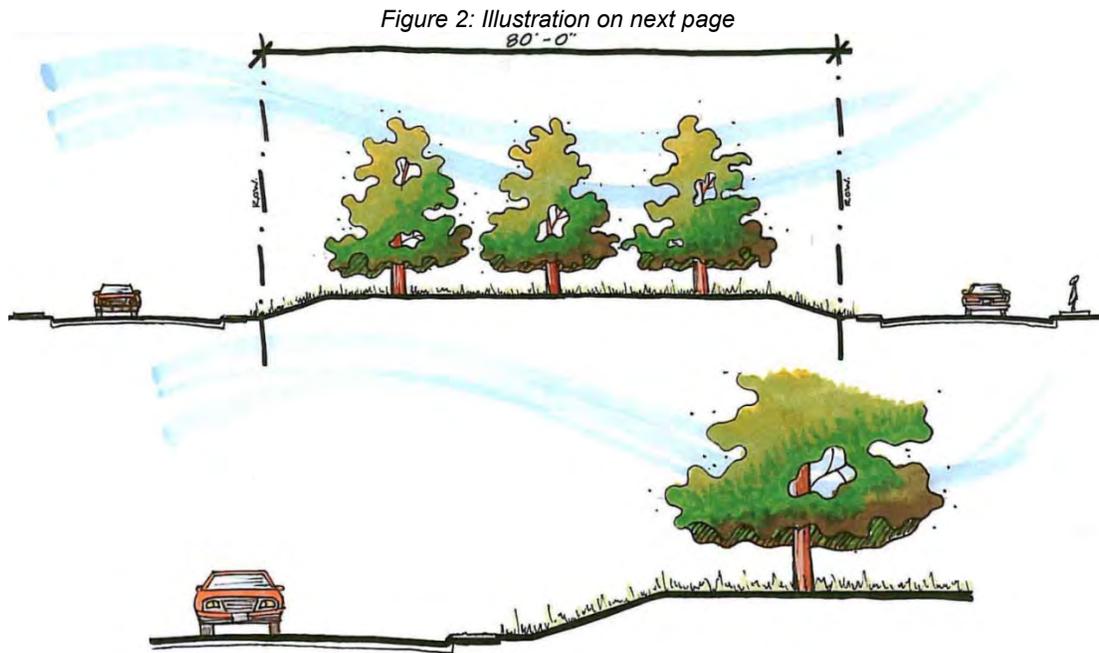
Street Buffer Strip Elevation and Street Cross-Section Elevations.
